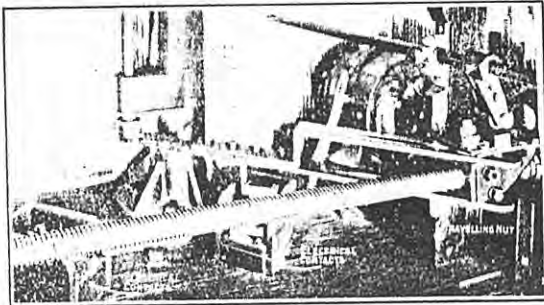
Fig. XLIV.—Pymont Bridge — Motor, Gearing, Screwed Shaft, Travelling Nut, Levers and Electrical Contacts for operating Gates.
